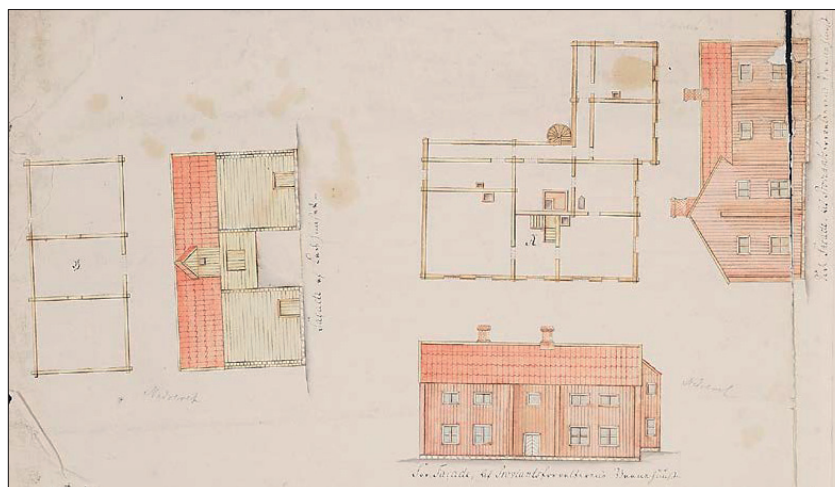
Detail of Eckleff's 1758 plan of Kongsgården showing the plans of the first (upper) floors of the dwelling house and barn and elevation drawings of their facades.¹²³¹
